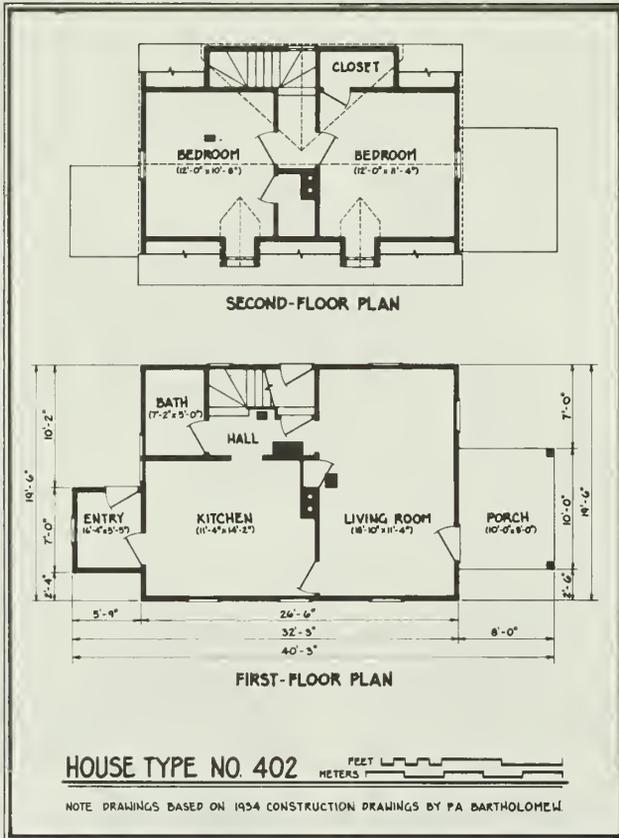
Plans of Type 402 house. Delineator: Isabel C. Yang, HABS.
